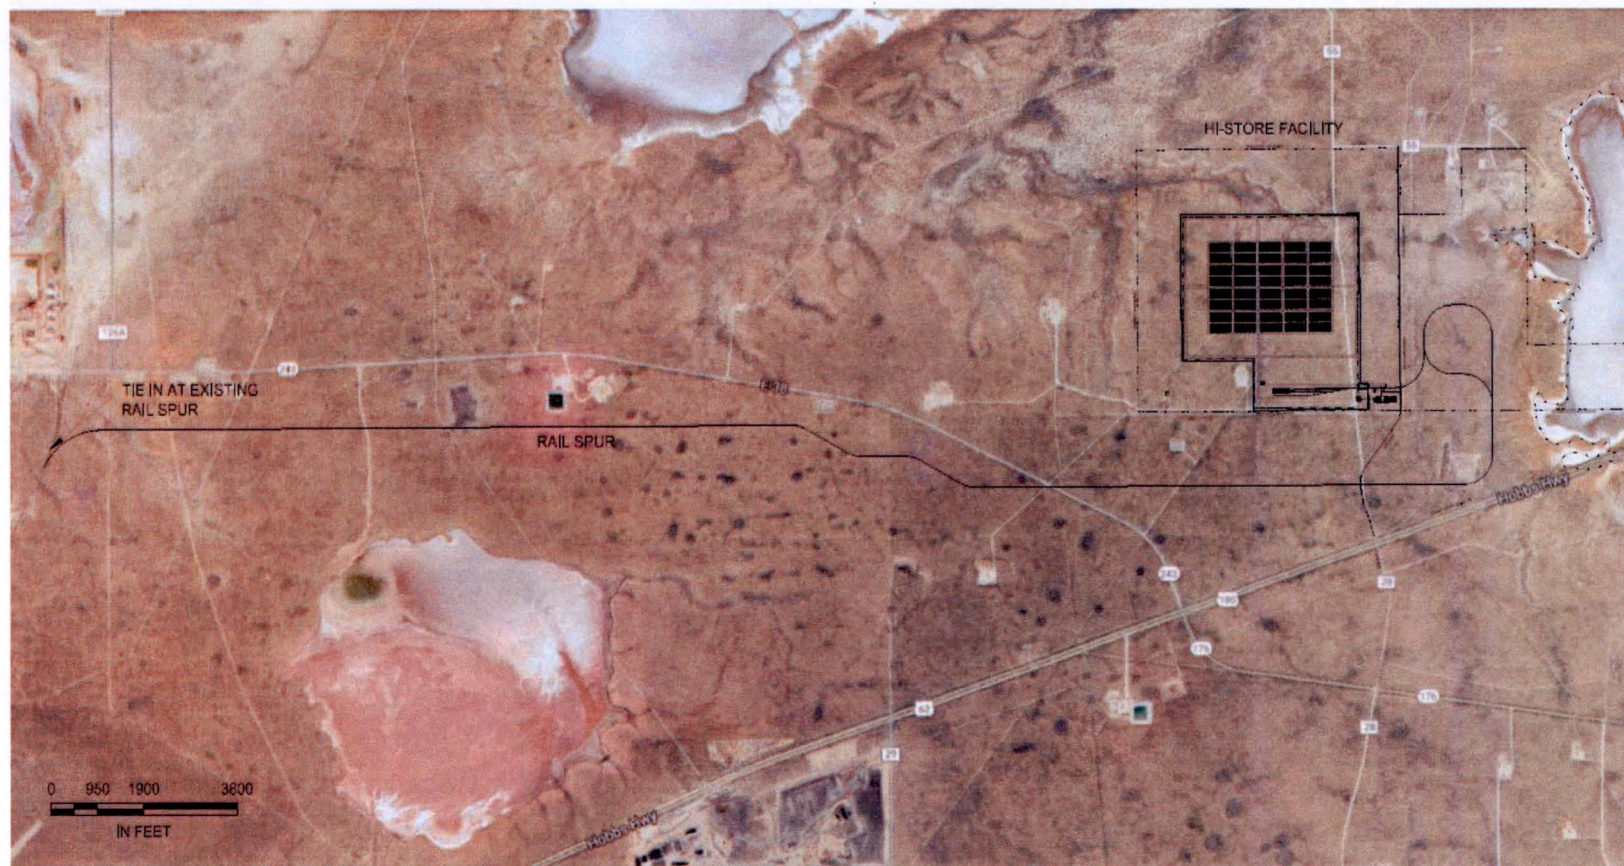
Aerial View of the Site (Full Build-Out) [2.1.8]
